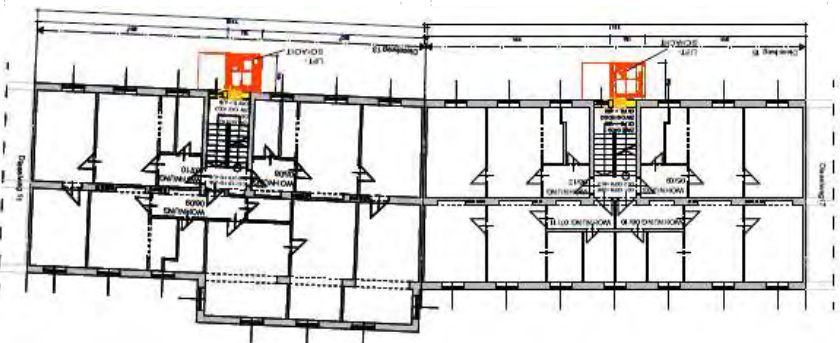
Floor plan of Dieselweg 13 and 15 – new lifts are marked in red
